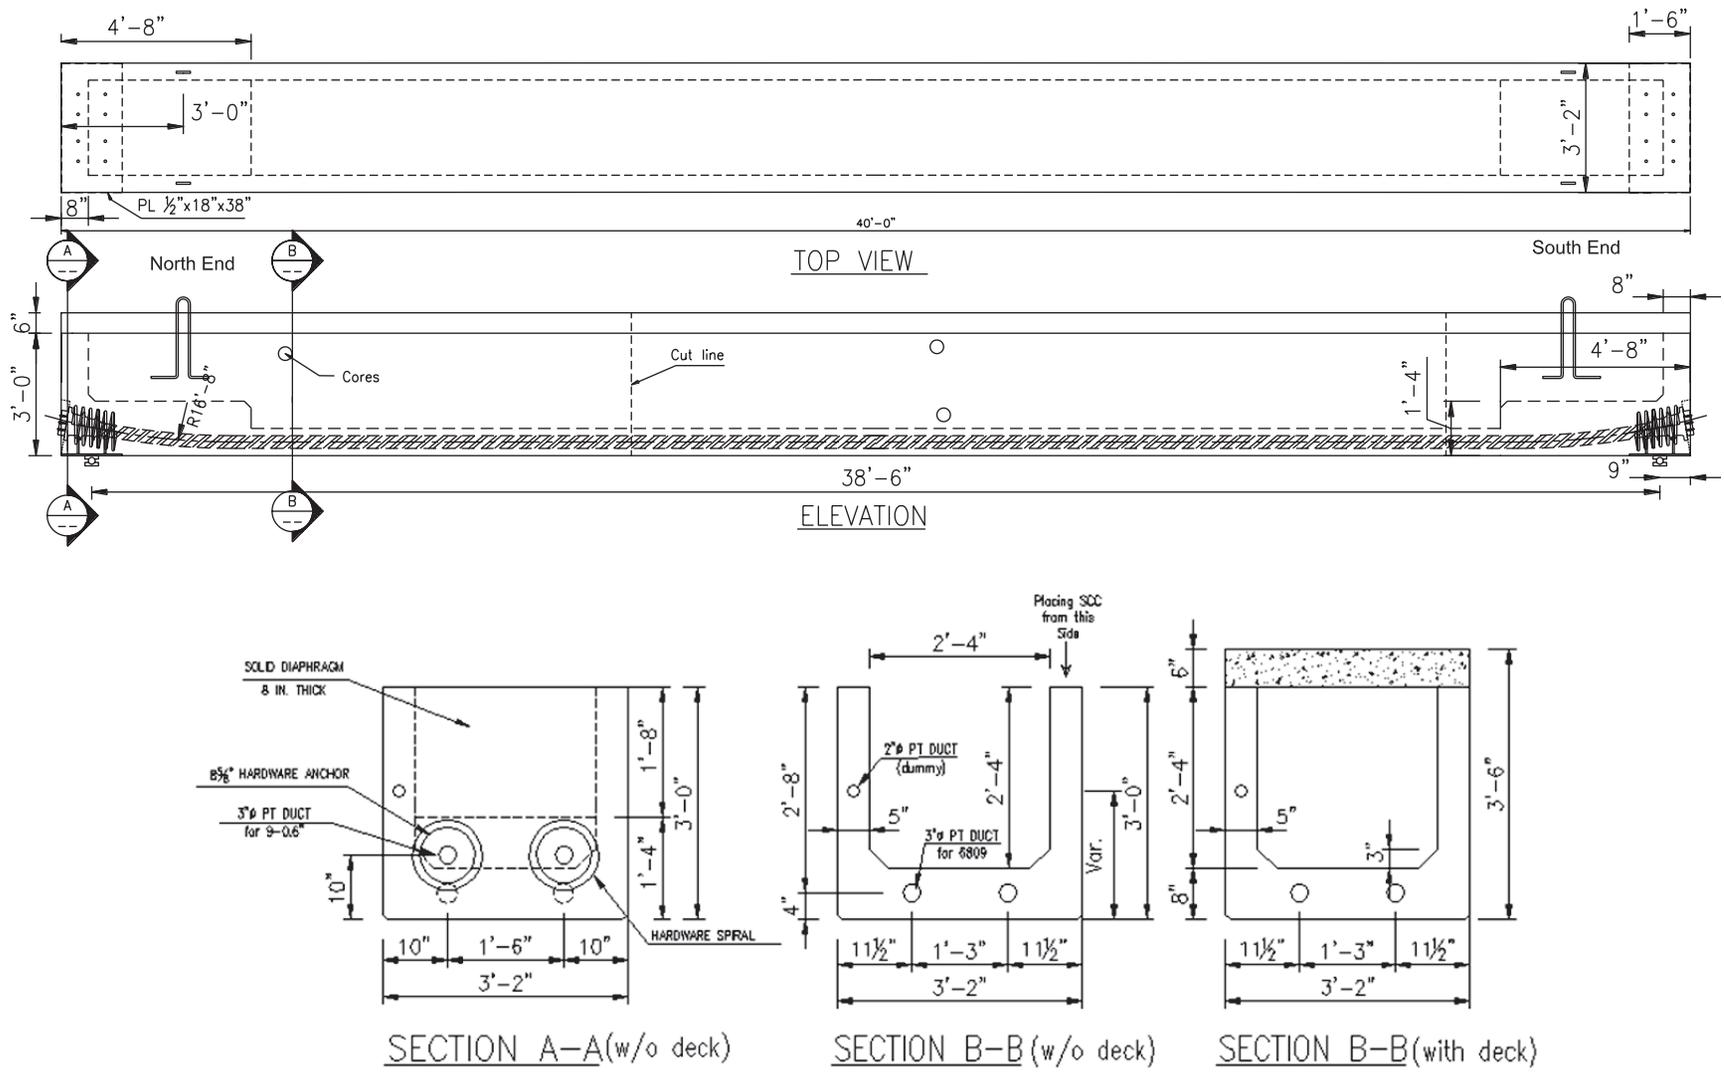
Views of the bridge post-tensioned box girder specimen.
